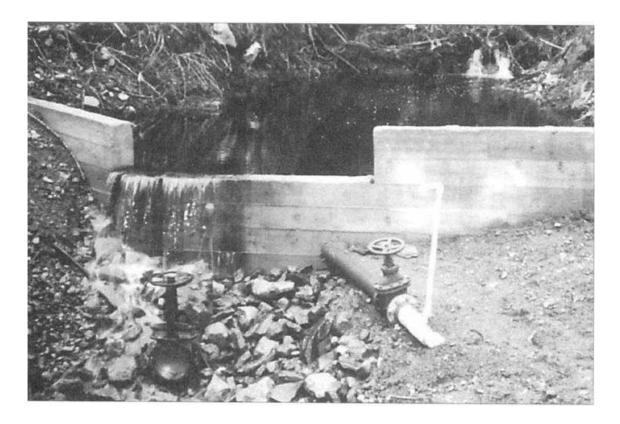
Example of an intake design with concrete weir, embedded penstock, and drainage pipe (Smith and Maher, 2001)
